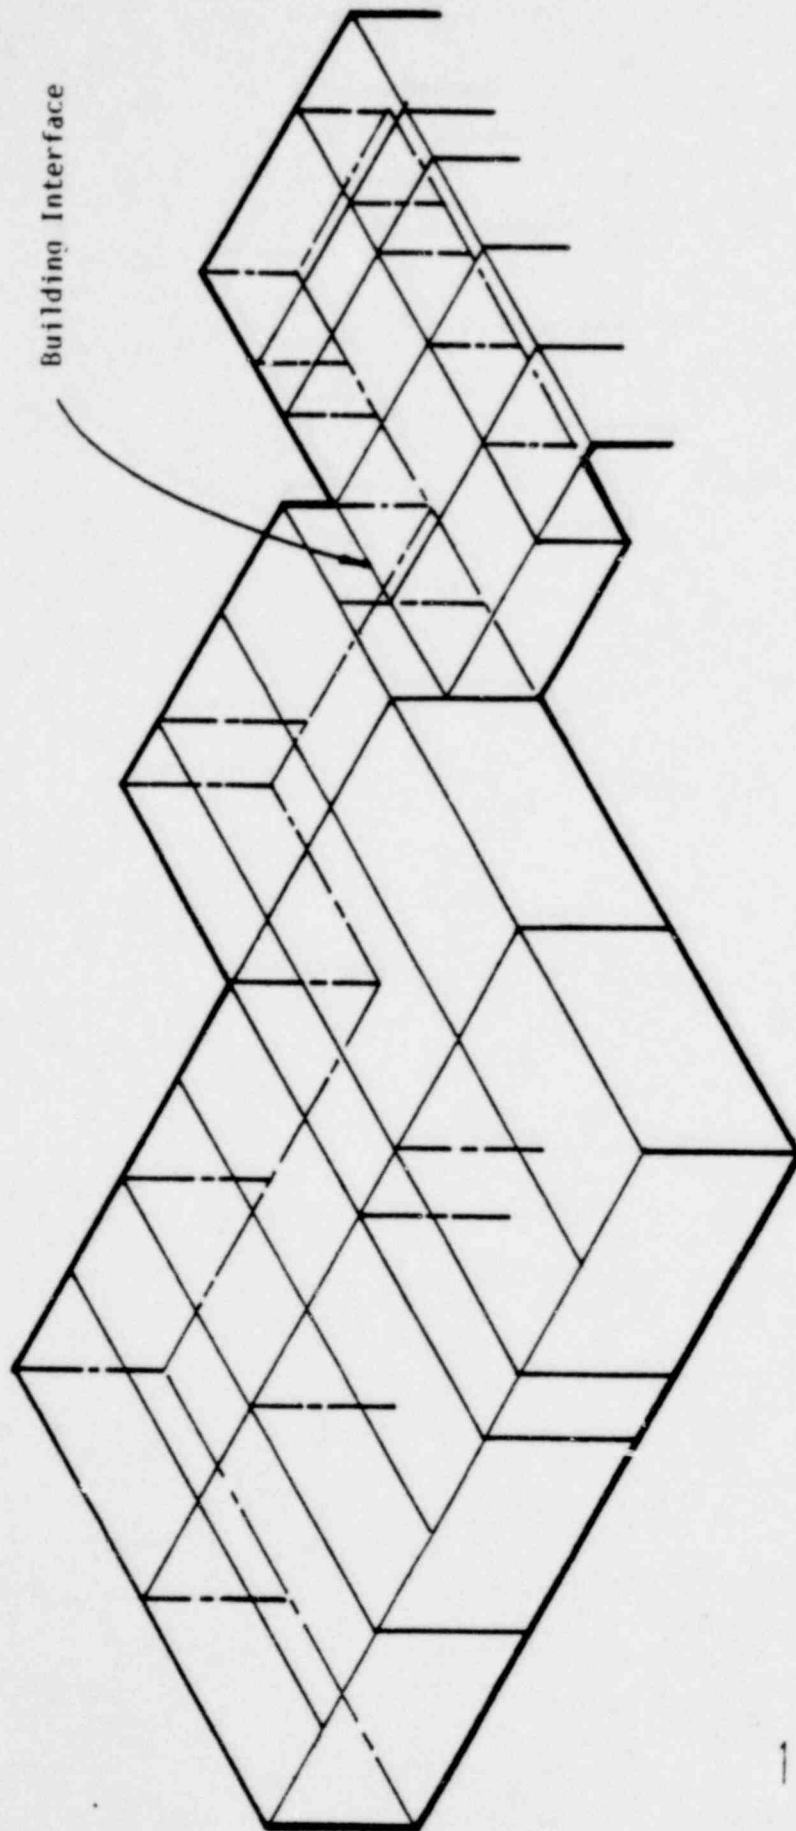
STRUCTURAL STEEL FRAMING FOR THE JN-4 FACILITY
